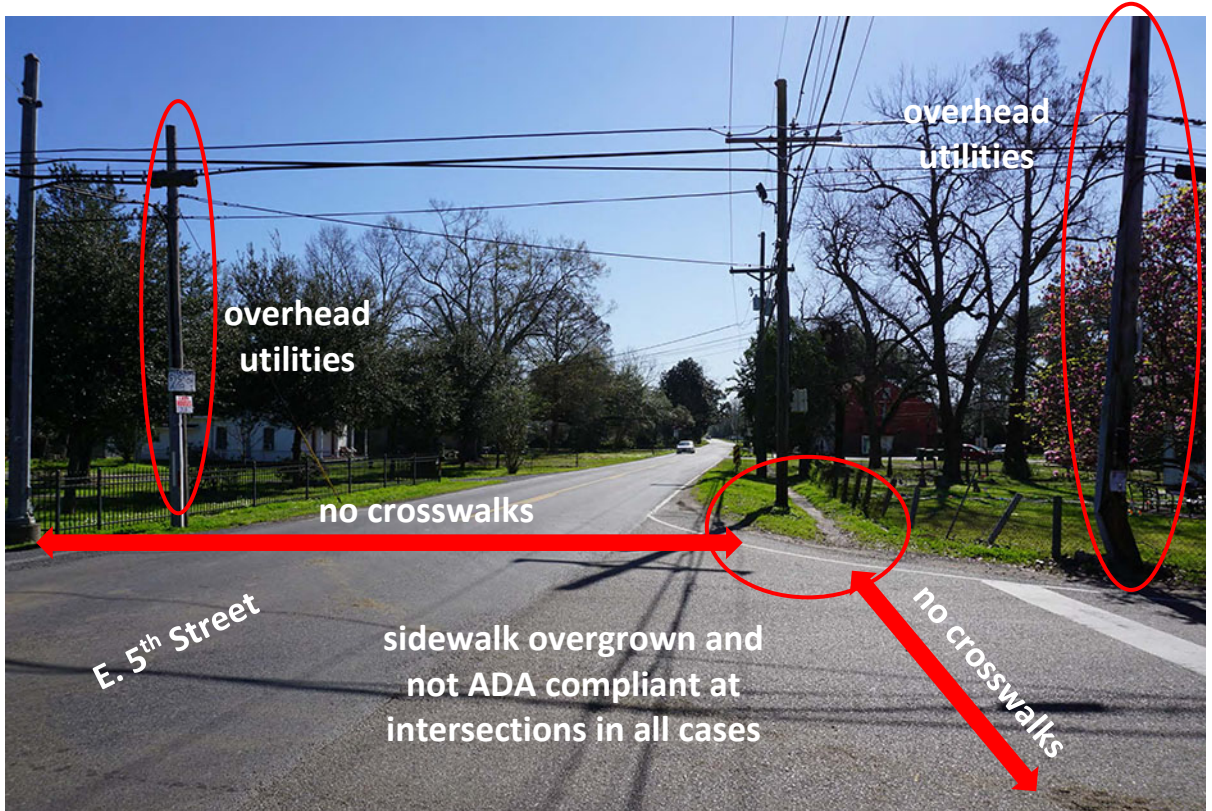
E. 5th St./Cardinal Street - overhead utilities, missing crosswalks, overgrown sidewalks
